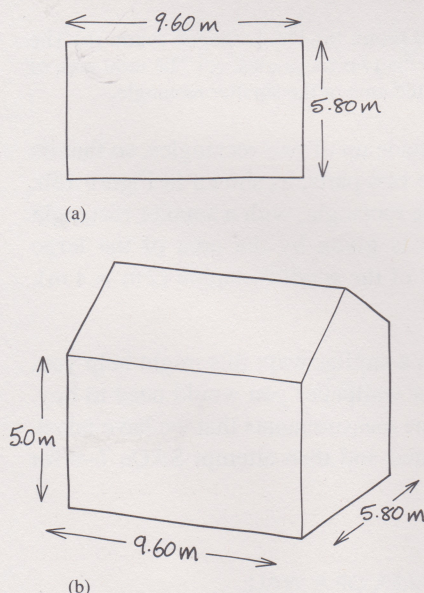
(a) Plan of a house. (b) Side view of a house.
